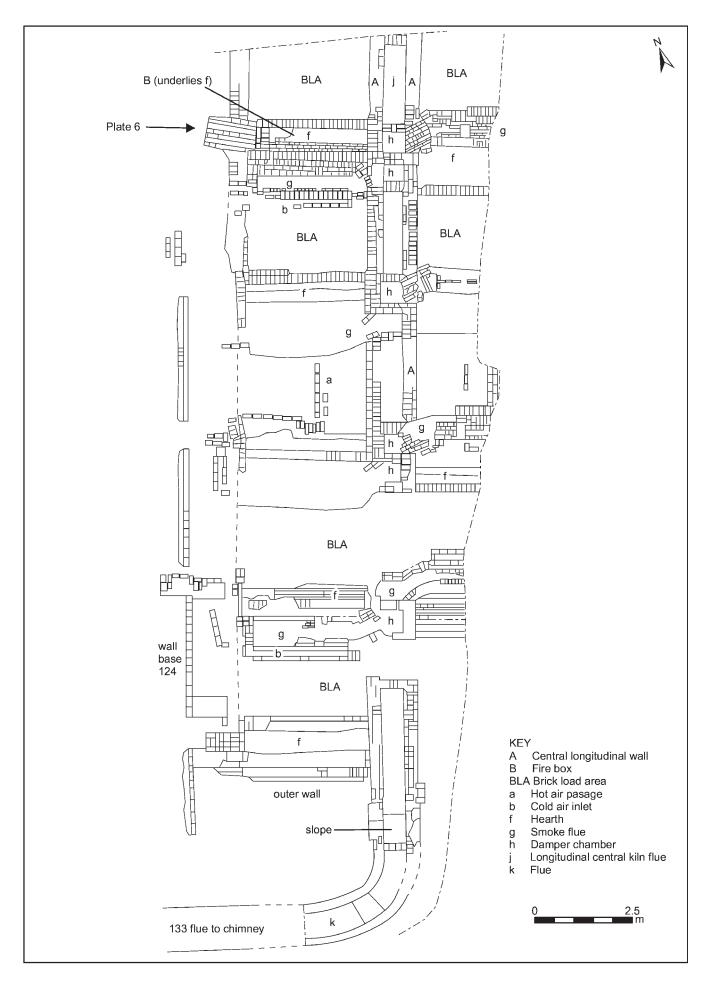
Seymour Street, Chelmsford. Plan of the continuous kiln.
